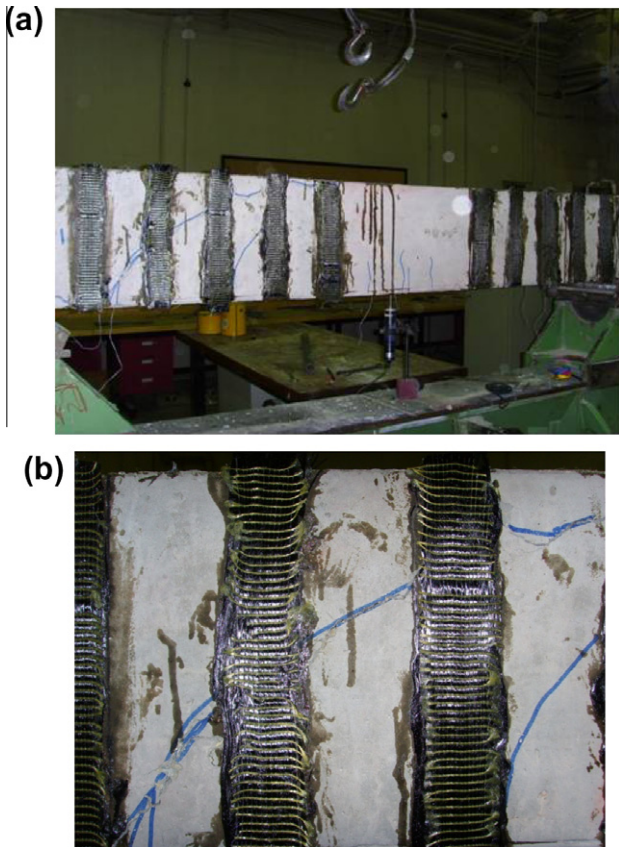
Failure of the vertical-strip strengthened RC beam specimen.
